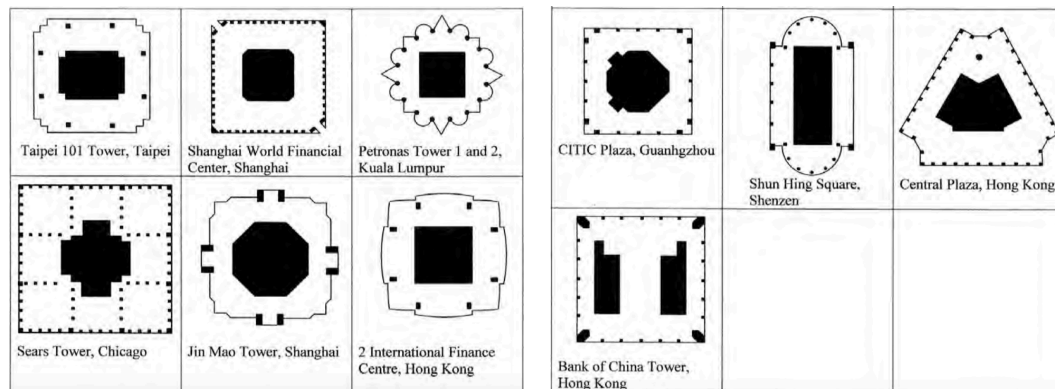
1: Geometry of Typical Floor Plans of Ten Tallest Office Buildings of the World (Özgen, 2009).
